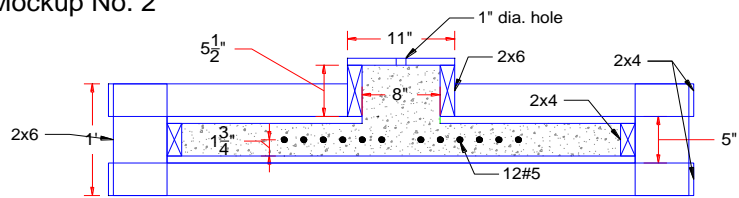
Dimensions and reinforcement of the field test No. 2 specimen
